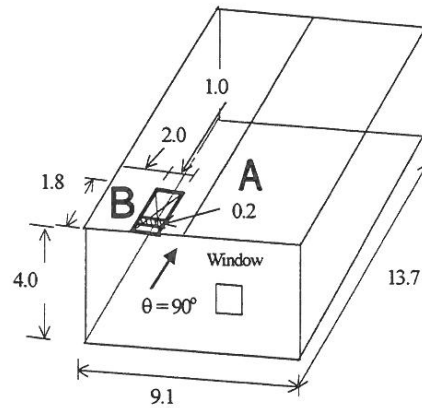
13.7 × 9.1 × 4.0 m Texas Tech full-scale building showing windward roof edge regions A (1.0 × 0.2 m²) and B (1.0 × 1.8 m²)
